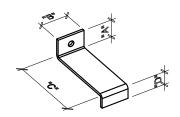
"Z" STRAP ANCHOR @ HEADER
